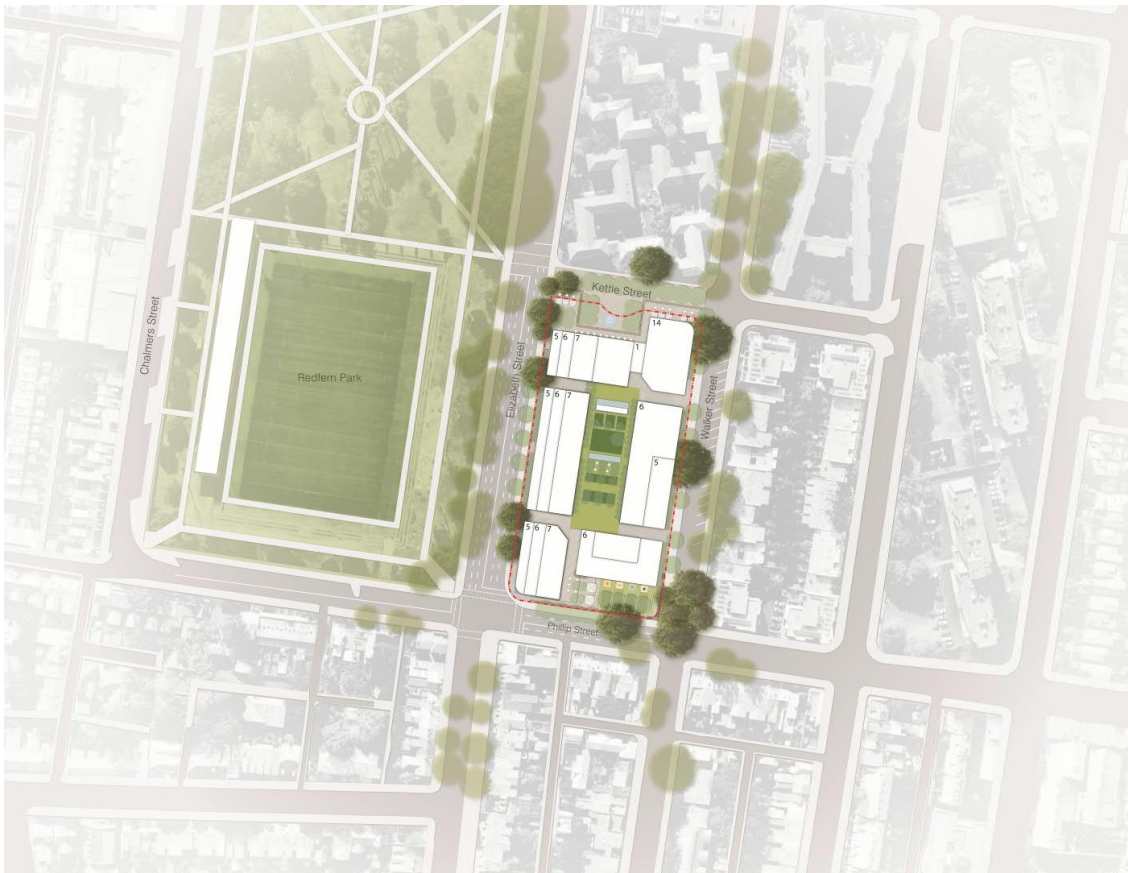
600-660 Elizabeth St, Redfern, reference scheme plan view
